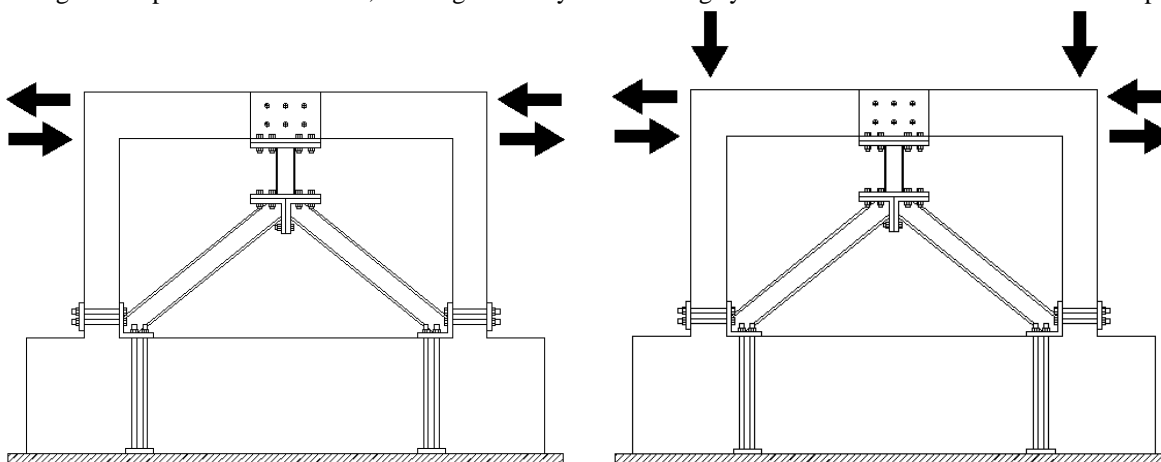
Specimens F3 and F3,N strengthened by steel bracing system and a steel link element at the top.
